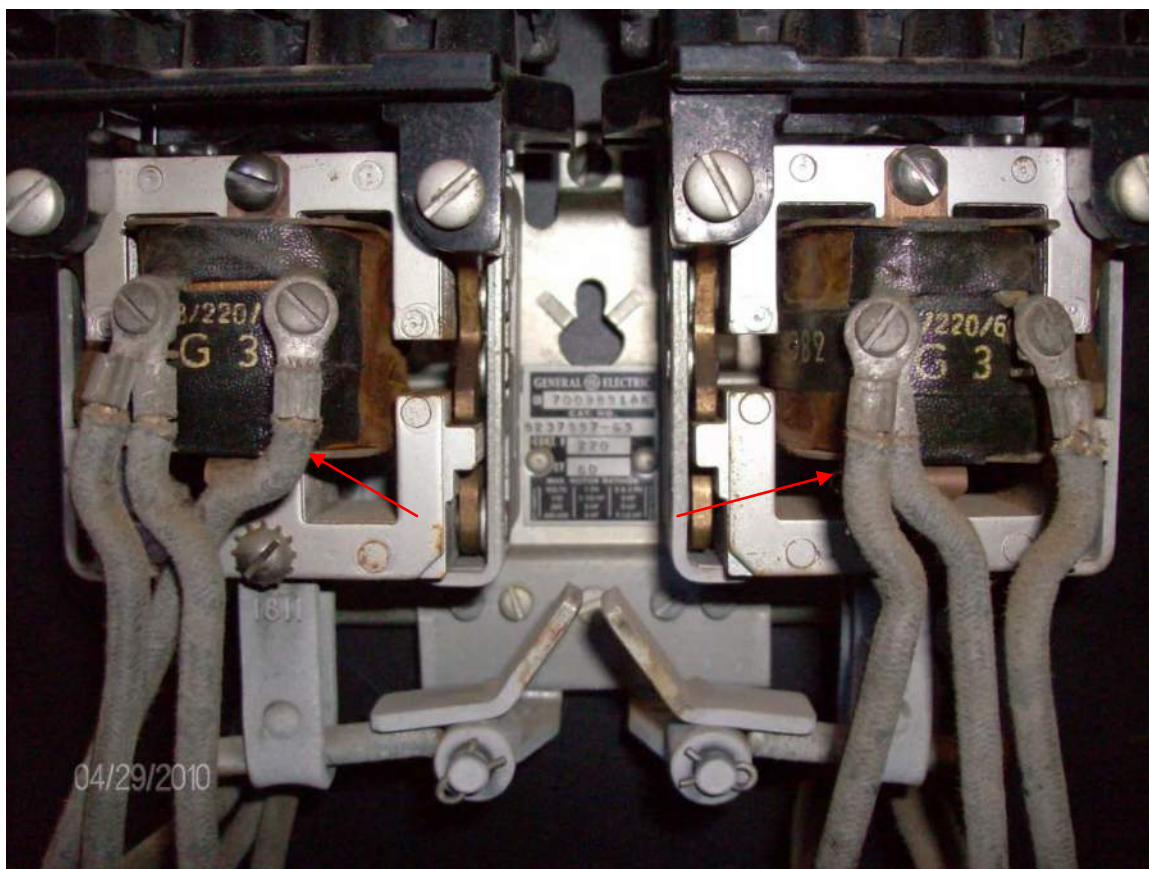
, Full voltage reversing contactor inside the MCC showing deteriorated wiring.
